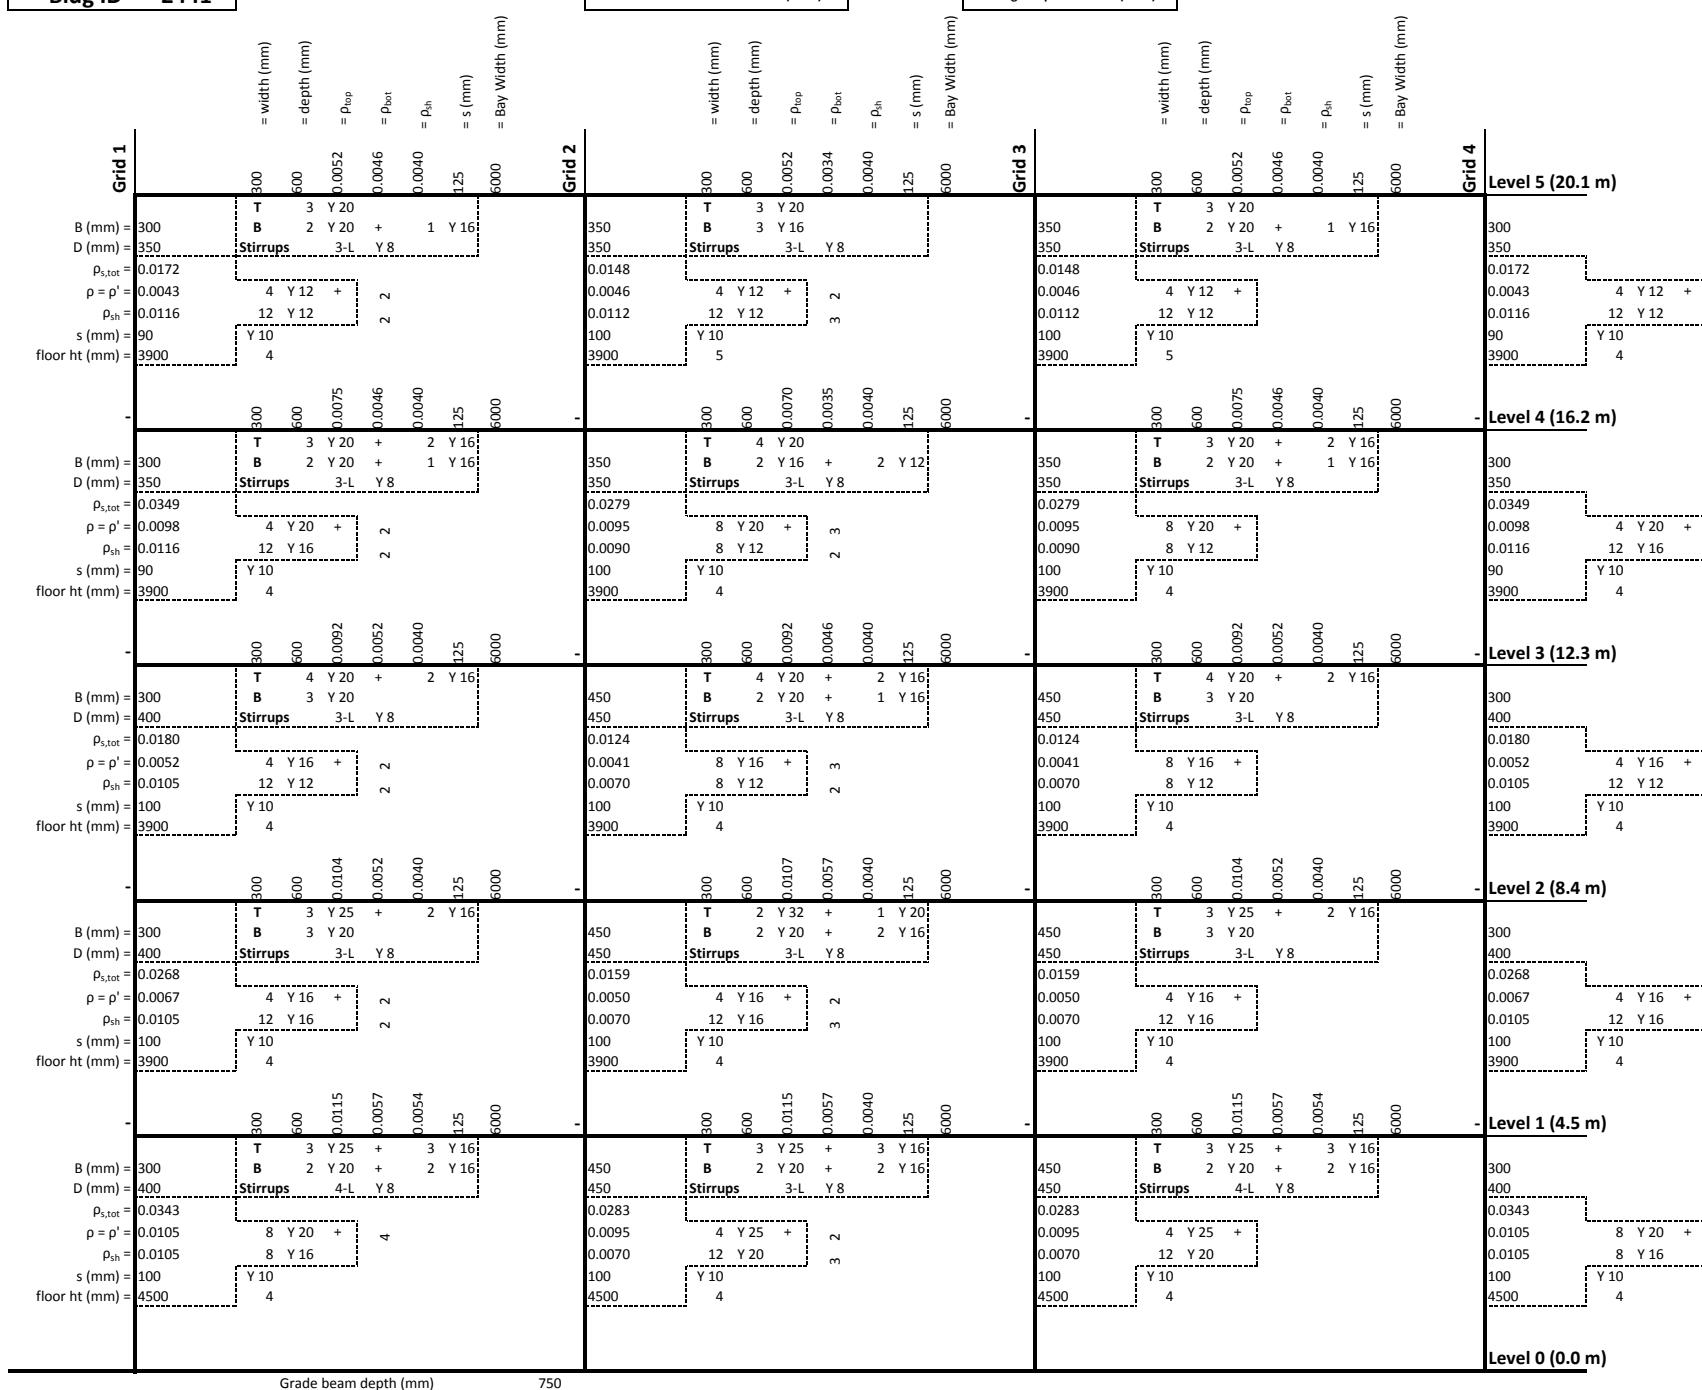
Provided reinforcement and modeling details for building ID 2441
